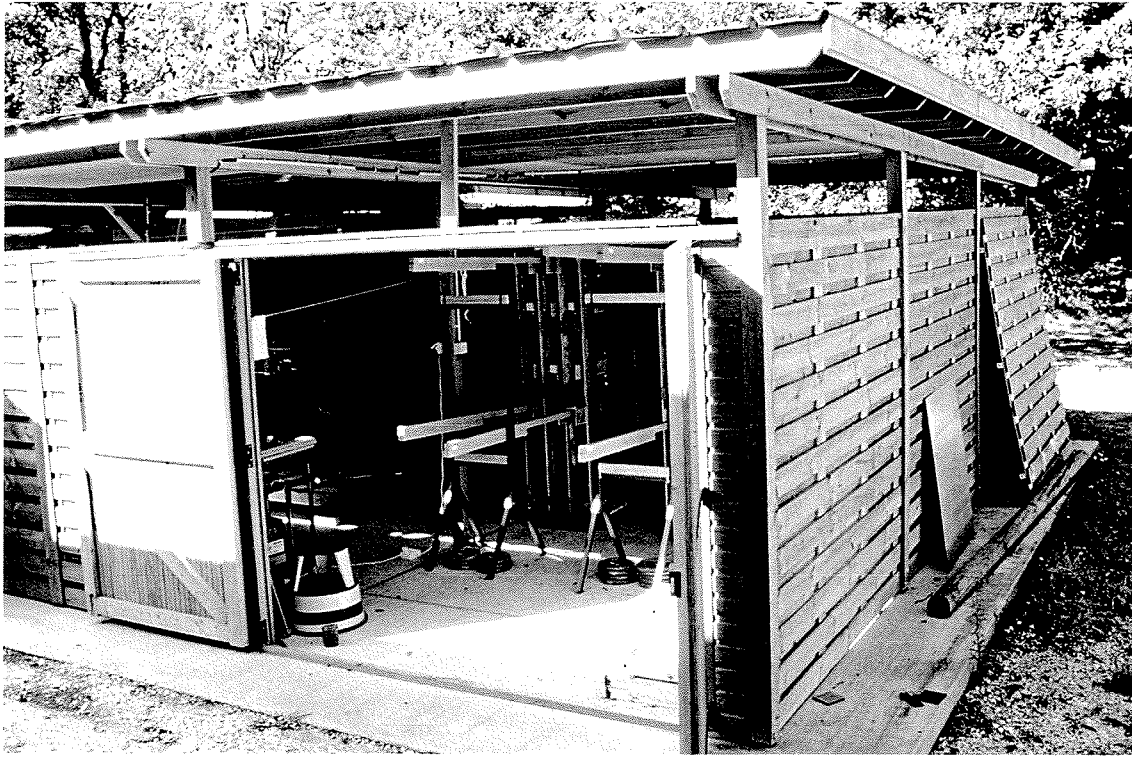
60 rigs (dead load - notched beams in LAB5) - external
